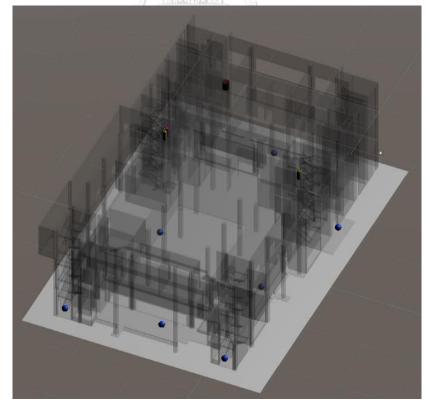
Fire extinguisher installation plan for 3rd floor of scenario 1D
